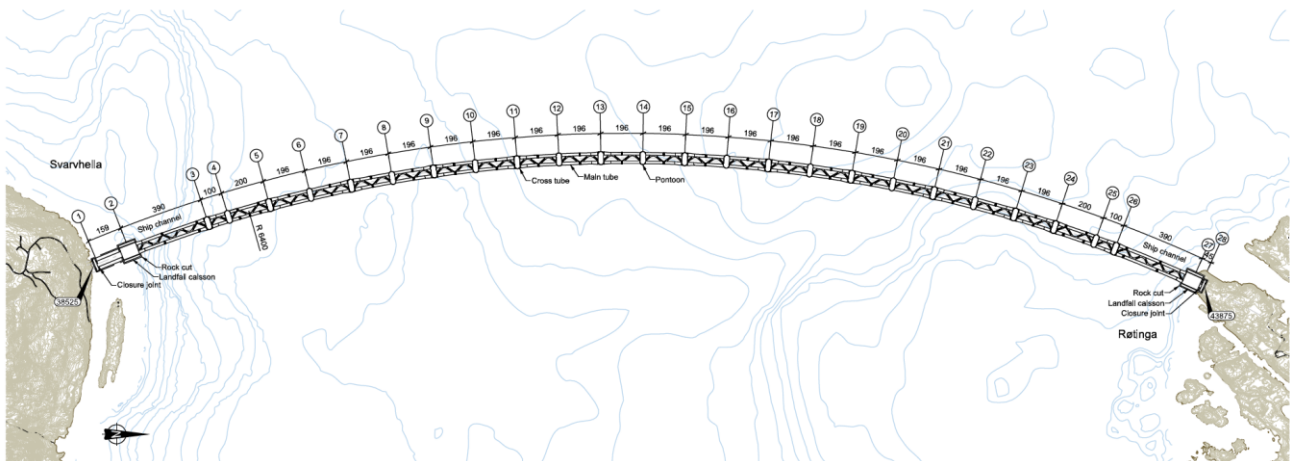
Plan view of the pontoon-stabilized SFT [33]
